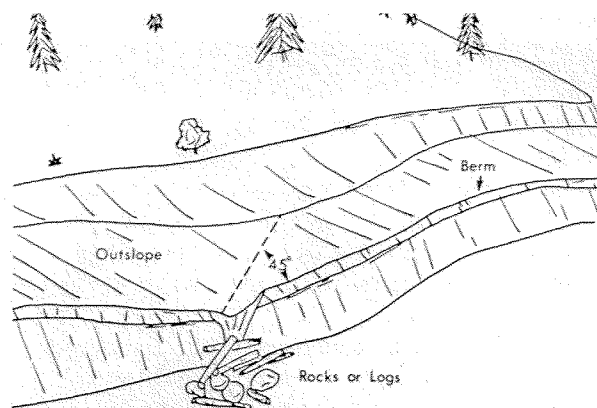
Rolled grade and crossdrain (after Haussman 1960).
